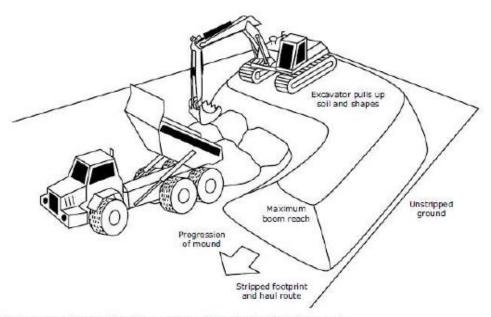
Soil storage mound construction with excavators and dump trucks: Single tier mound.
